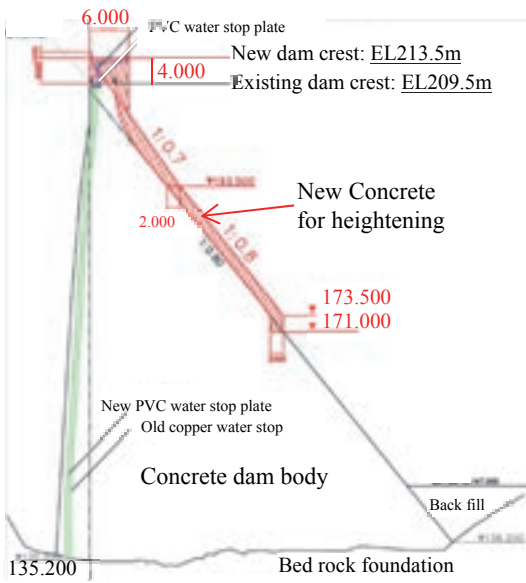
Cross-section of Block No.4 (Non-overflow section)
